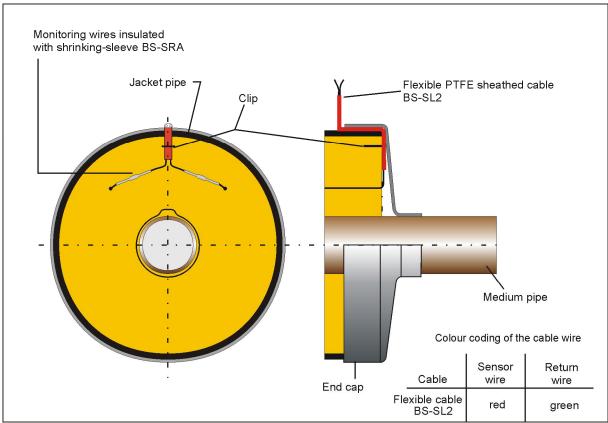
Example 2: Connecting the monitoring wires to flexible sheathed cable BS-SL2 and leading the wires out
